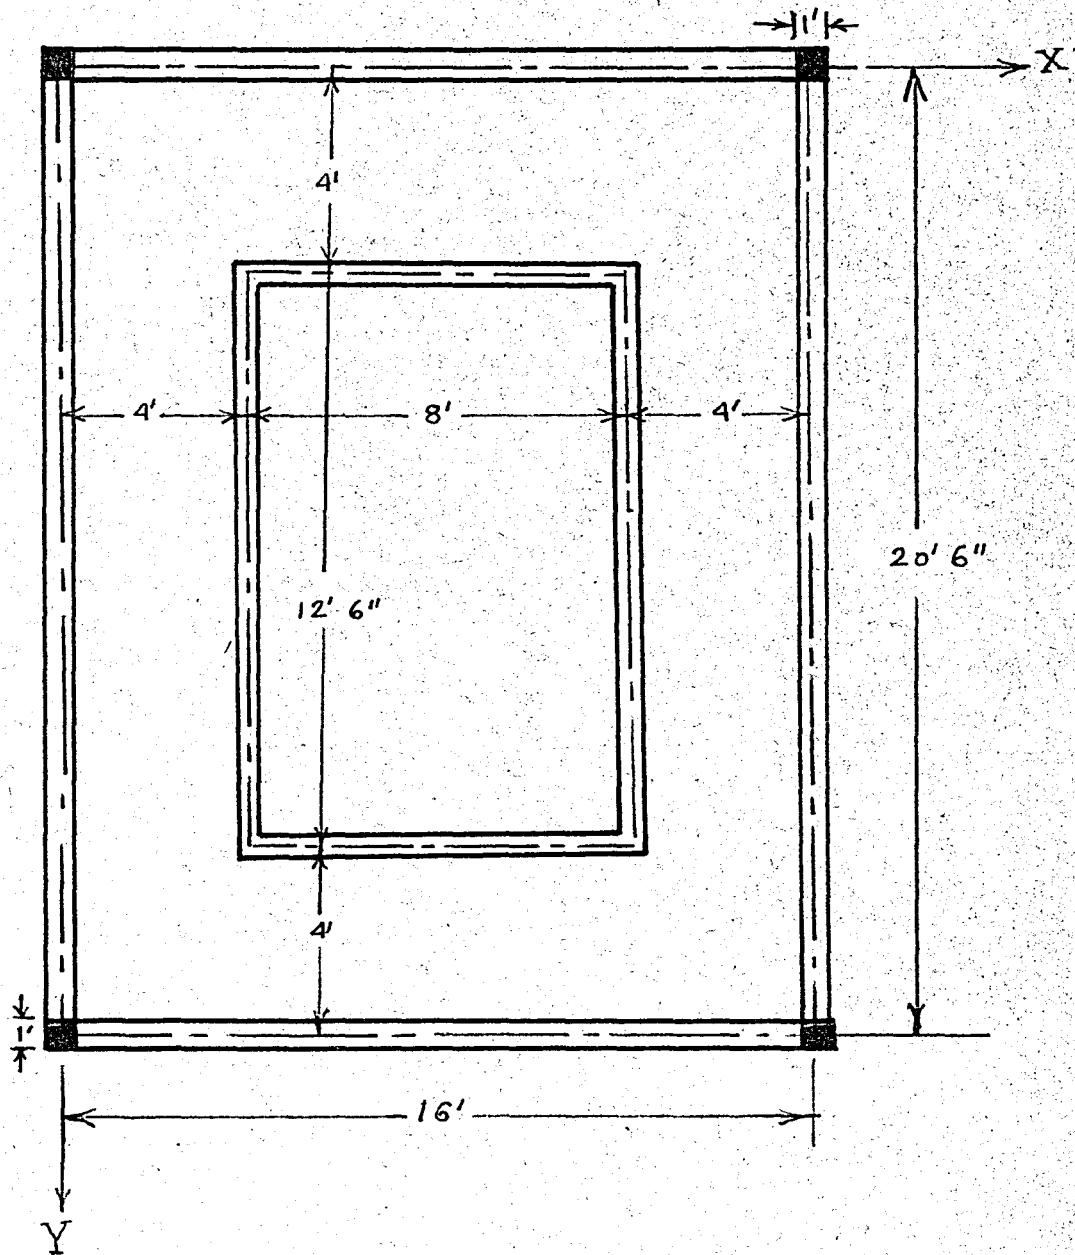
Plan of Stairway - Showing Columns & Direction.
